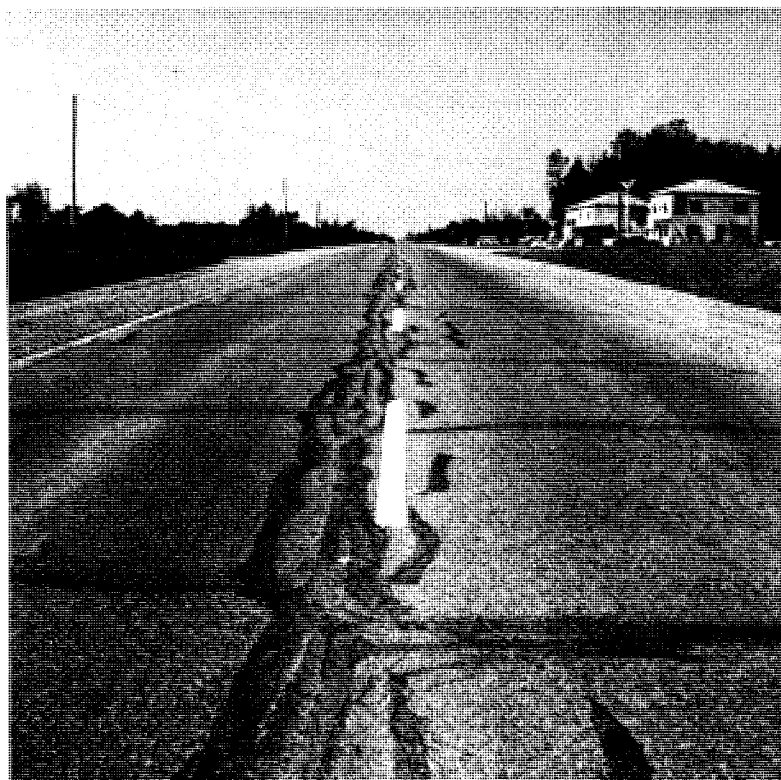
85-100 Penetration Pavement, Test Road 4, Located West of Orangeville, Ontario. 4-Years Old.
